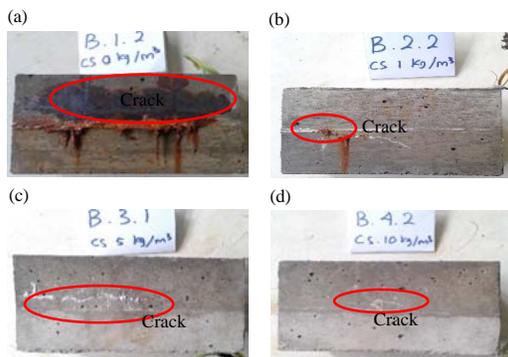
Cracks on concrete grade 40 MPa; a) Crack of CaS0-40; b) Crack of CaS1-40; c) Crack of CaS5-40; d) Crack of CaS10-40
